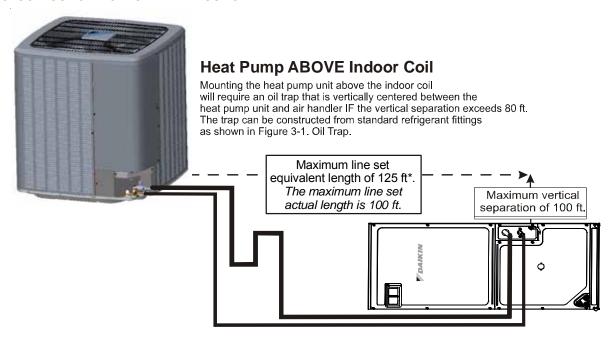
Installation of Refrigerant Piping (Horizontal)
